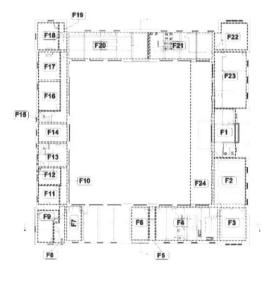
Floor plans with the approximate location of works to ground and first floor outlined in red
